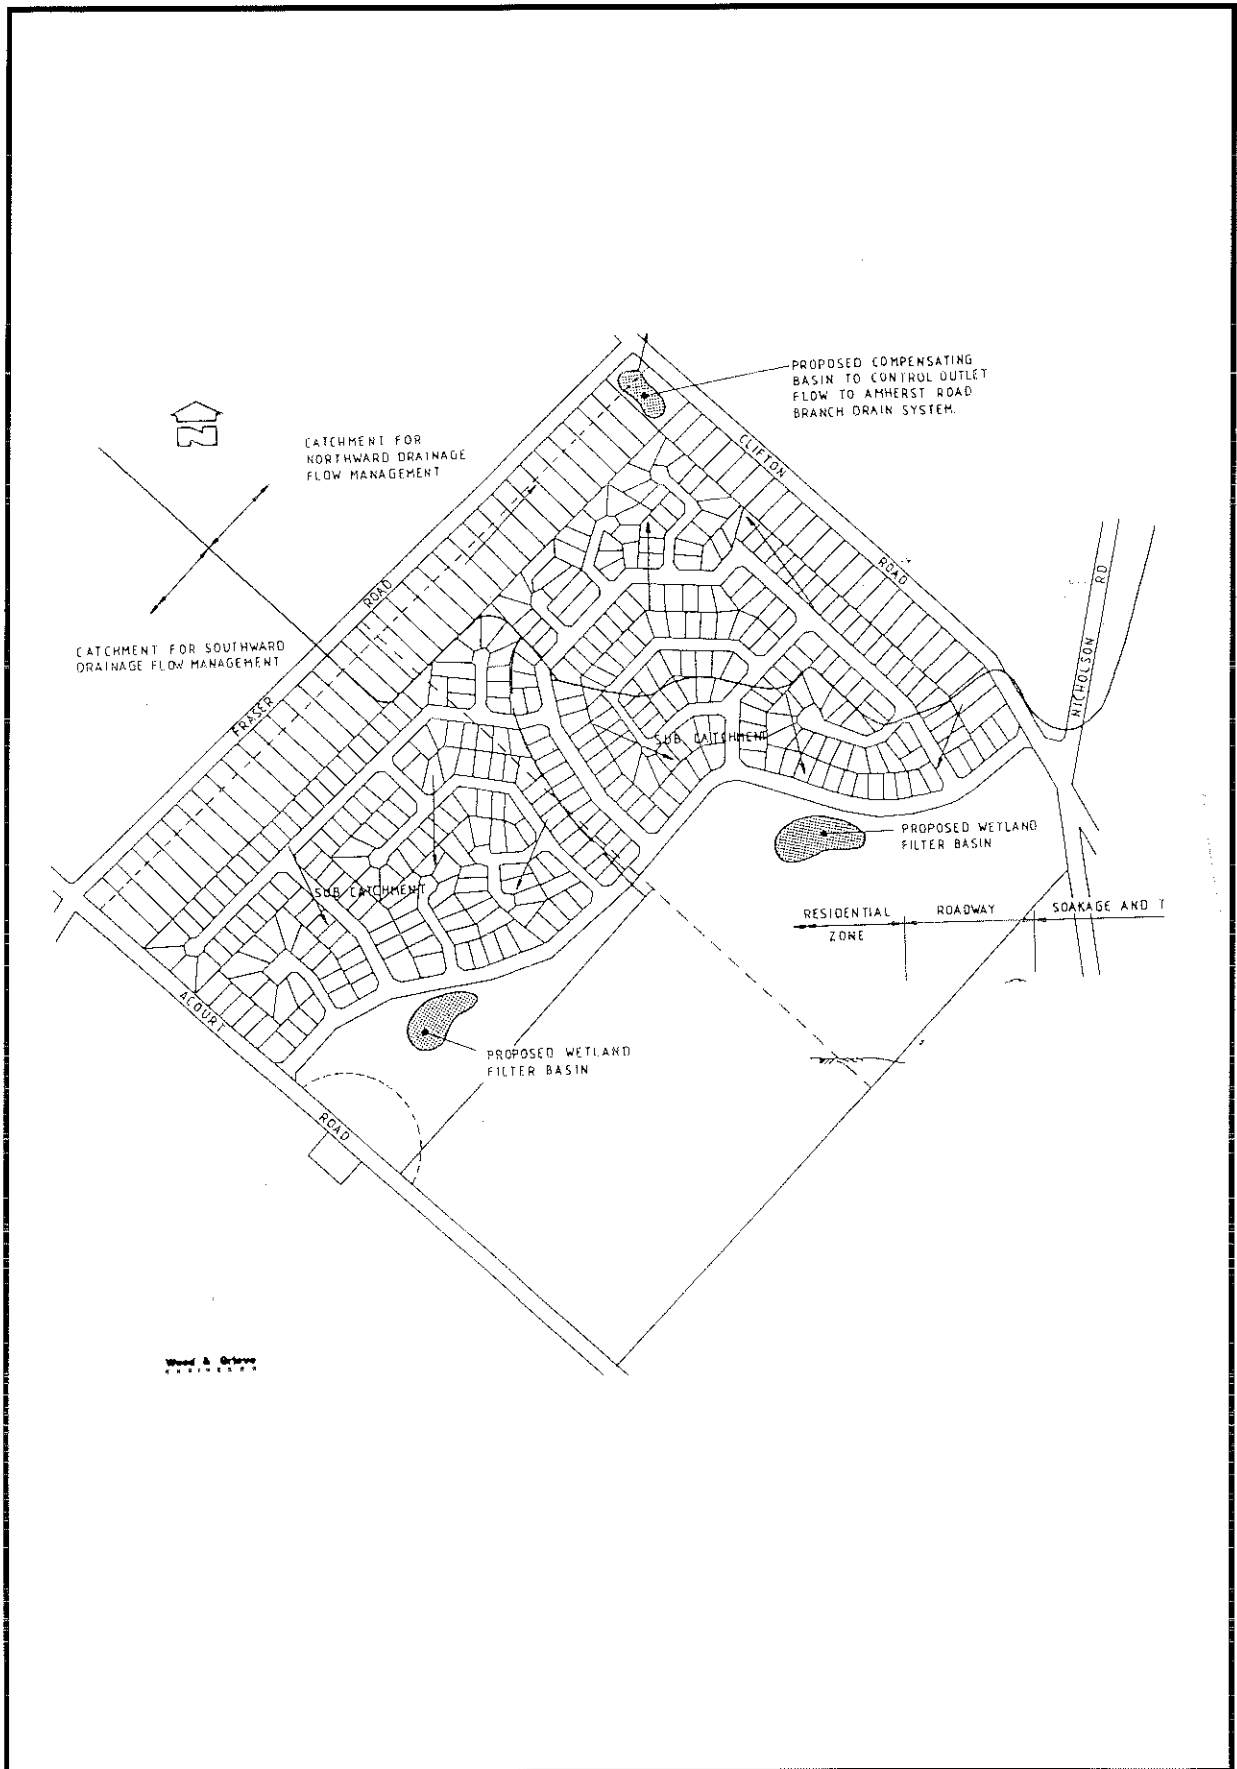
Plan of subdivision (from Wood & Grieve, CER).
